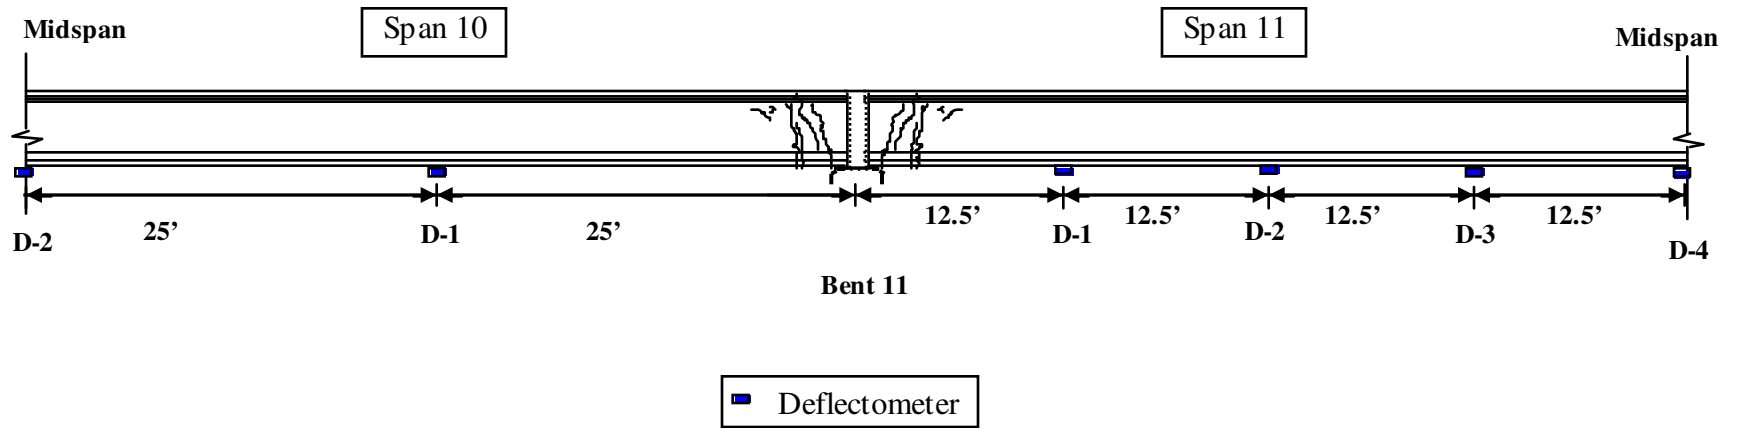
Girder 7 and 8 Deflectometer Locations
